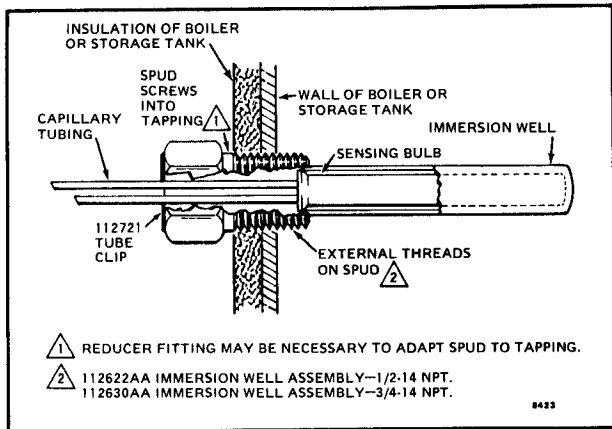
MOUNTING THE SENSING BULB IN AN IMMERSION WELL.
